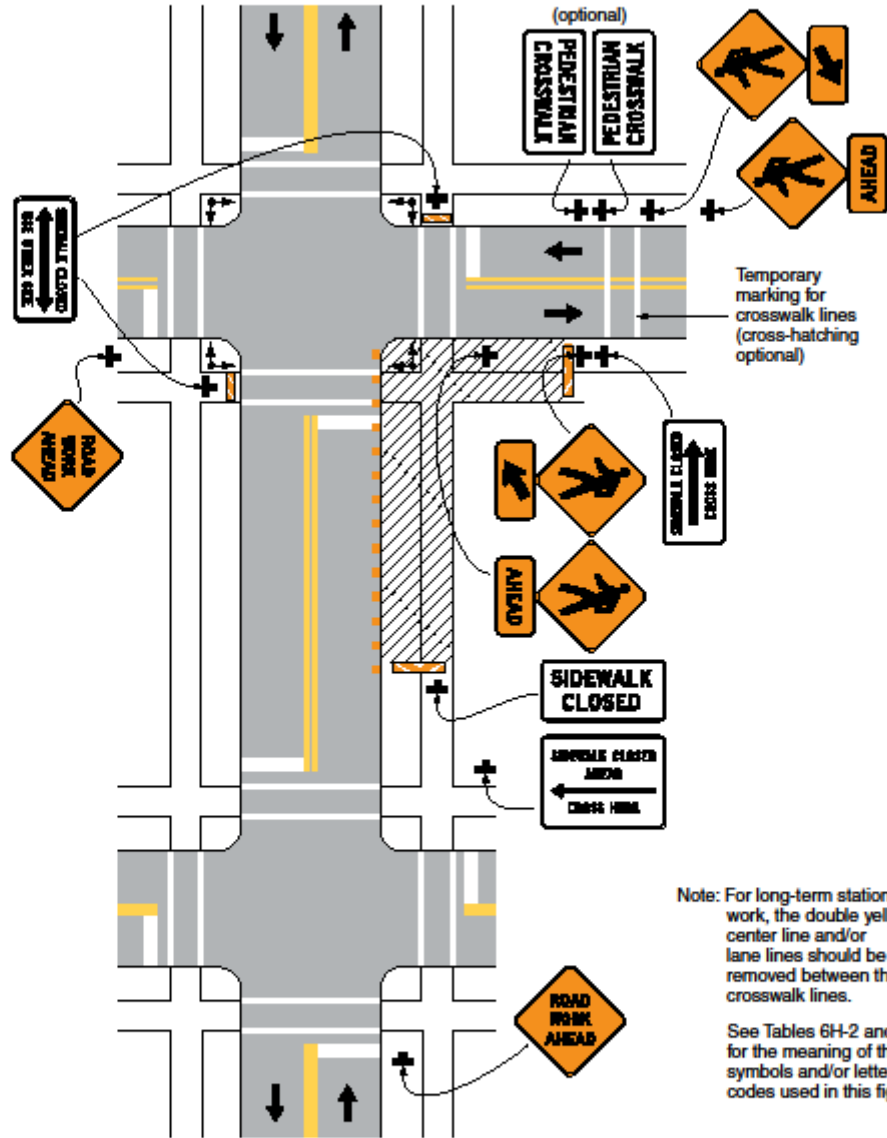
H-28. Sidewalk Detour or Diversion (TA-28)
